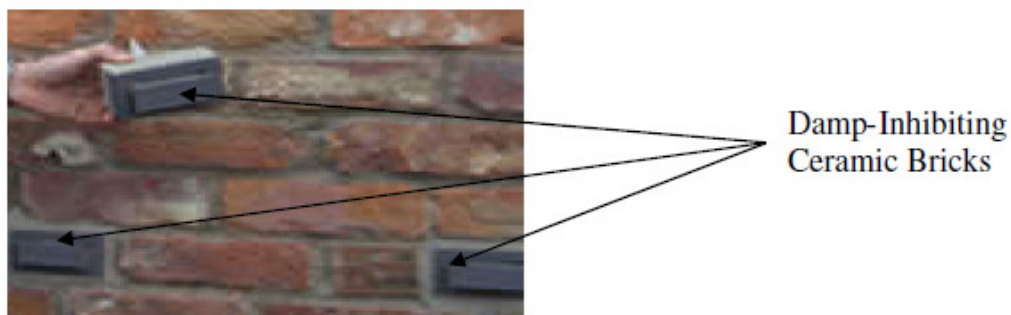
Installation of Holland damp proof bricks in a cavity wall [59]
